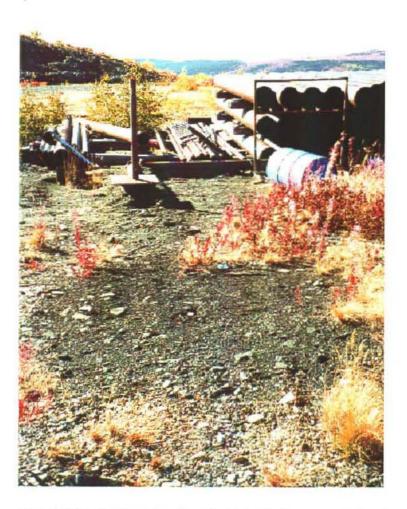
Drilling site with soil staining in foreground. Laydown of piping and empty hydraulic fluid barrel are in background.
